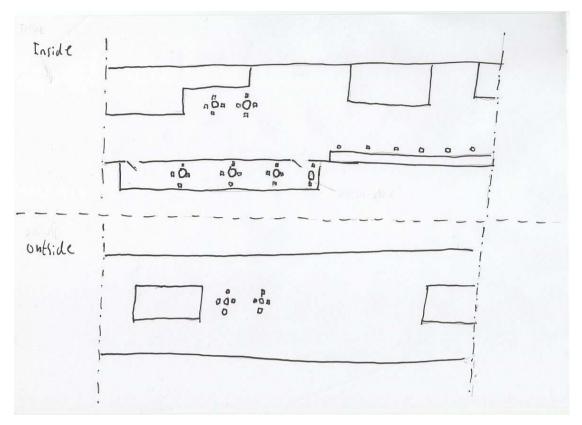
Sketch of the plan views of segments of the outside and inside deck of the pier. NTS
